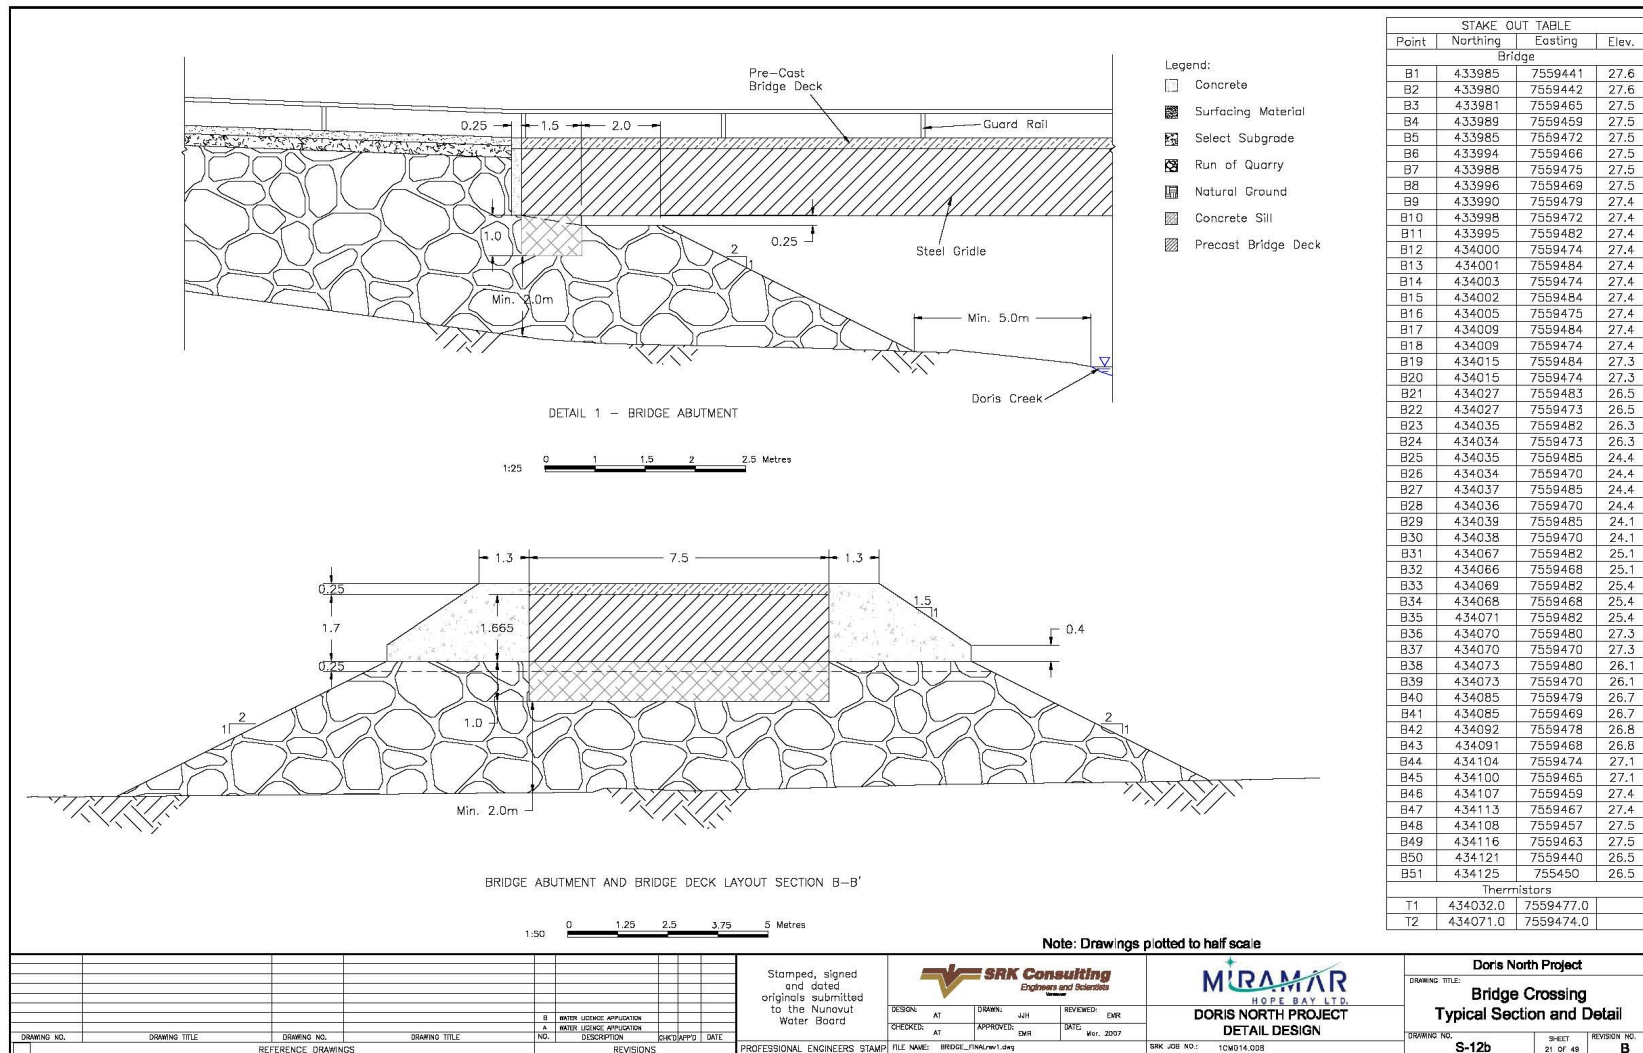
SRK Drawing S-12b – Bridge Crossing Typical Section and Detail
